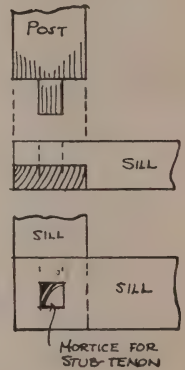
Elevation and Plan showing Method of Fixing Post to Sill
